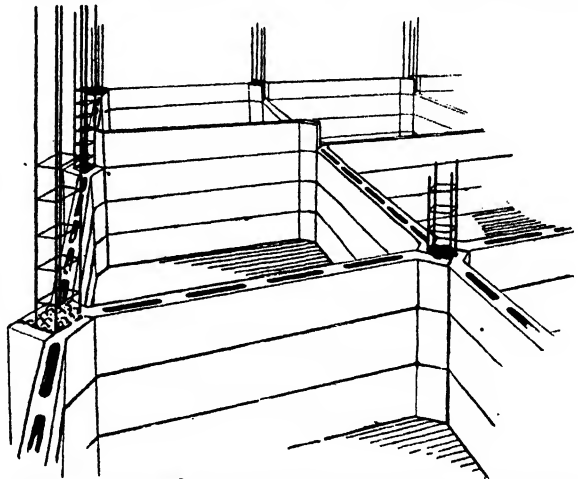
Square bins built up from pre-cast concrete sections. Note reinforcement at angles.
